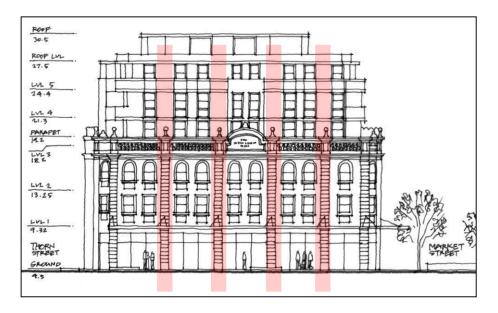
Extract of Hunter Street Elevation – red markup shows the alignment and proportions of cladding elements on the addition with the pilasters on the host building below.
